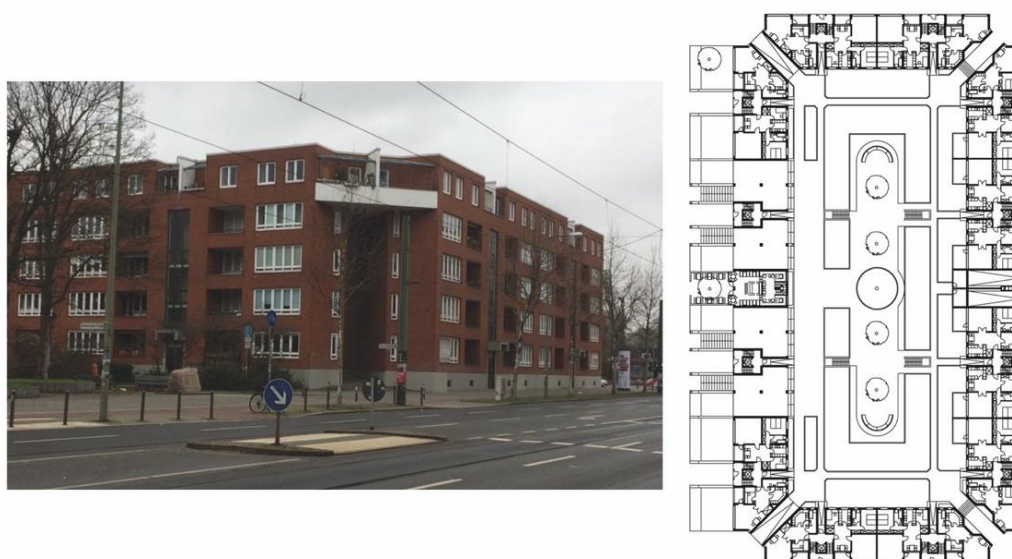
Block 270 on Vinetaplatz. View from the Street and Ground Floor Plan
